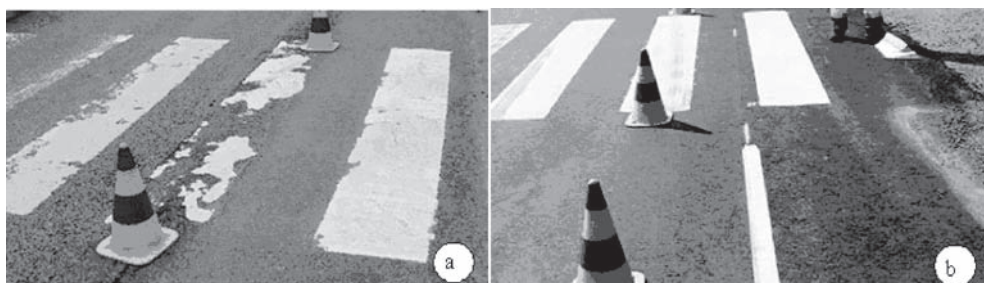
Test sites for road markings, (a) Road 140/1, (b) Road 140/3.
